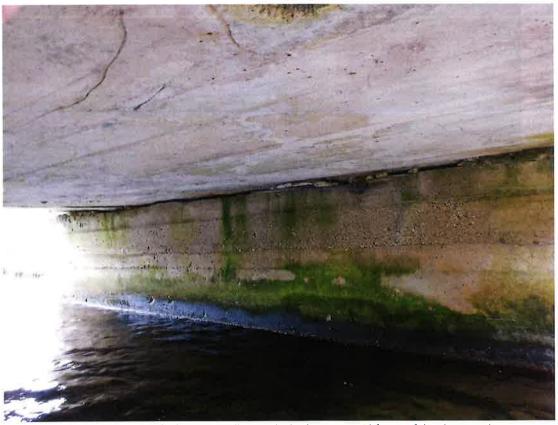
South Abutment – Note the gap at the slab/abutment juncture,
